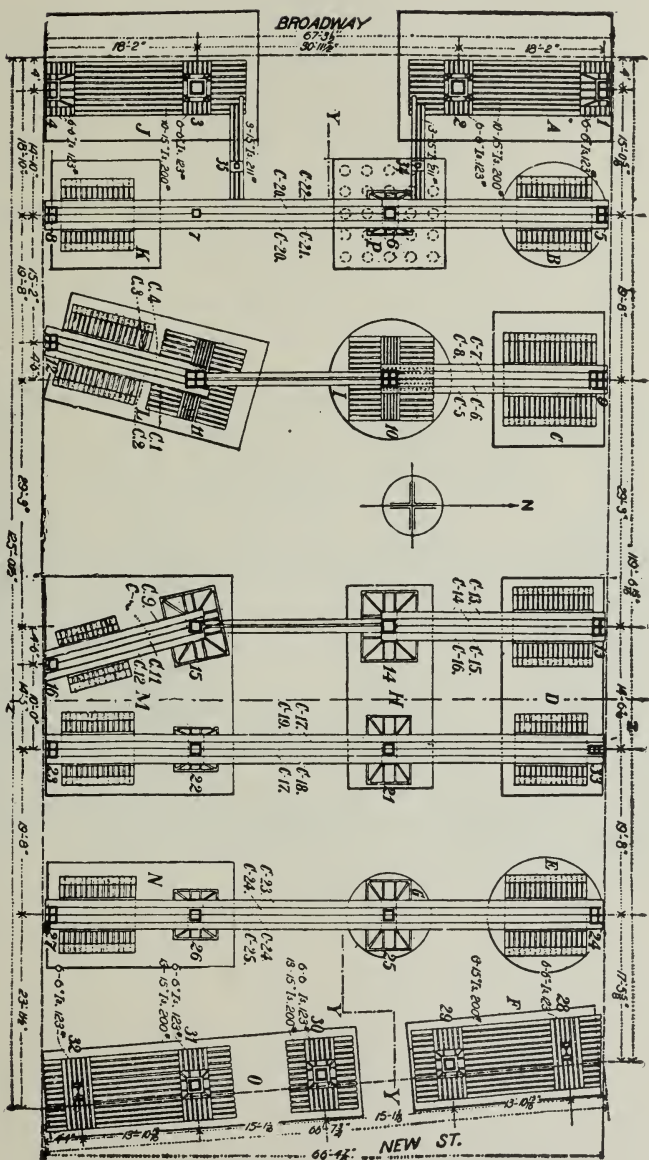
The Manhattan Life Insurance Building, New York City. Plan of Piers.
